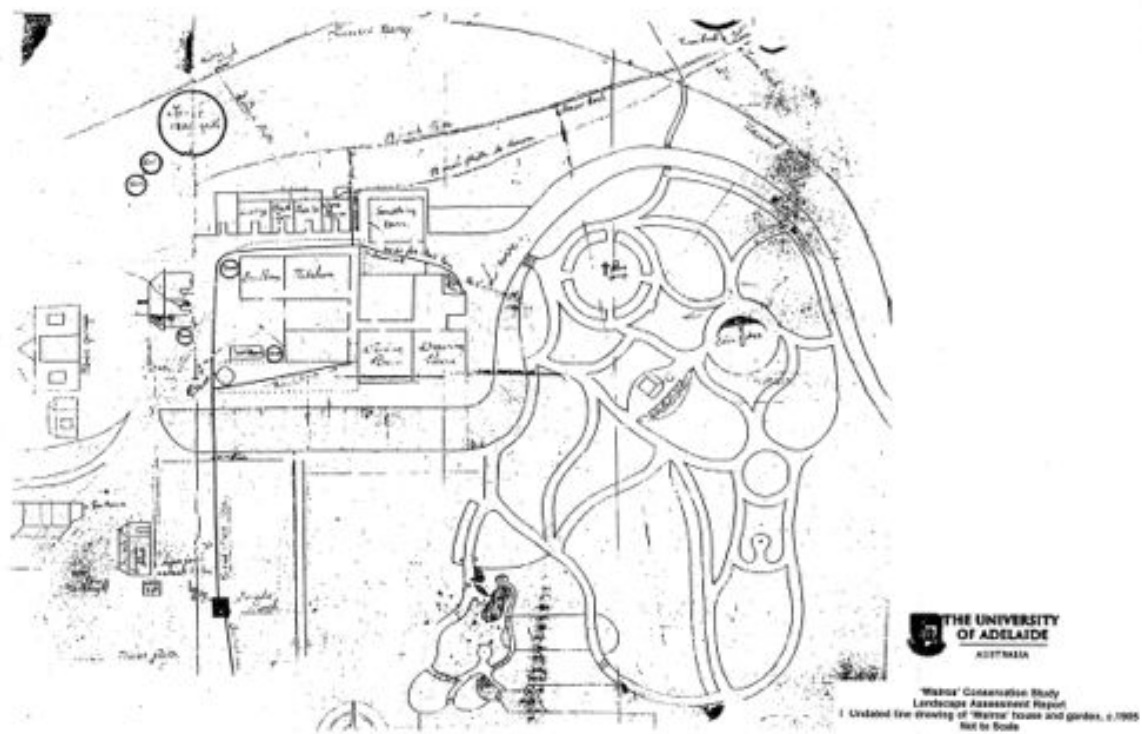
Hand-annotated layout plan of 'Wairoa' c.1905.
